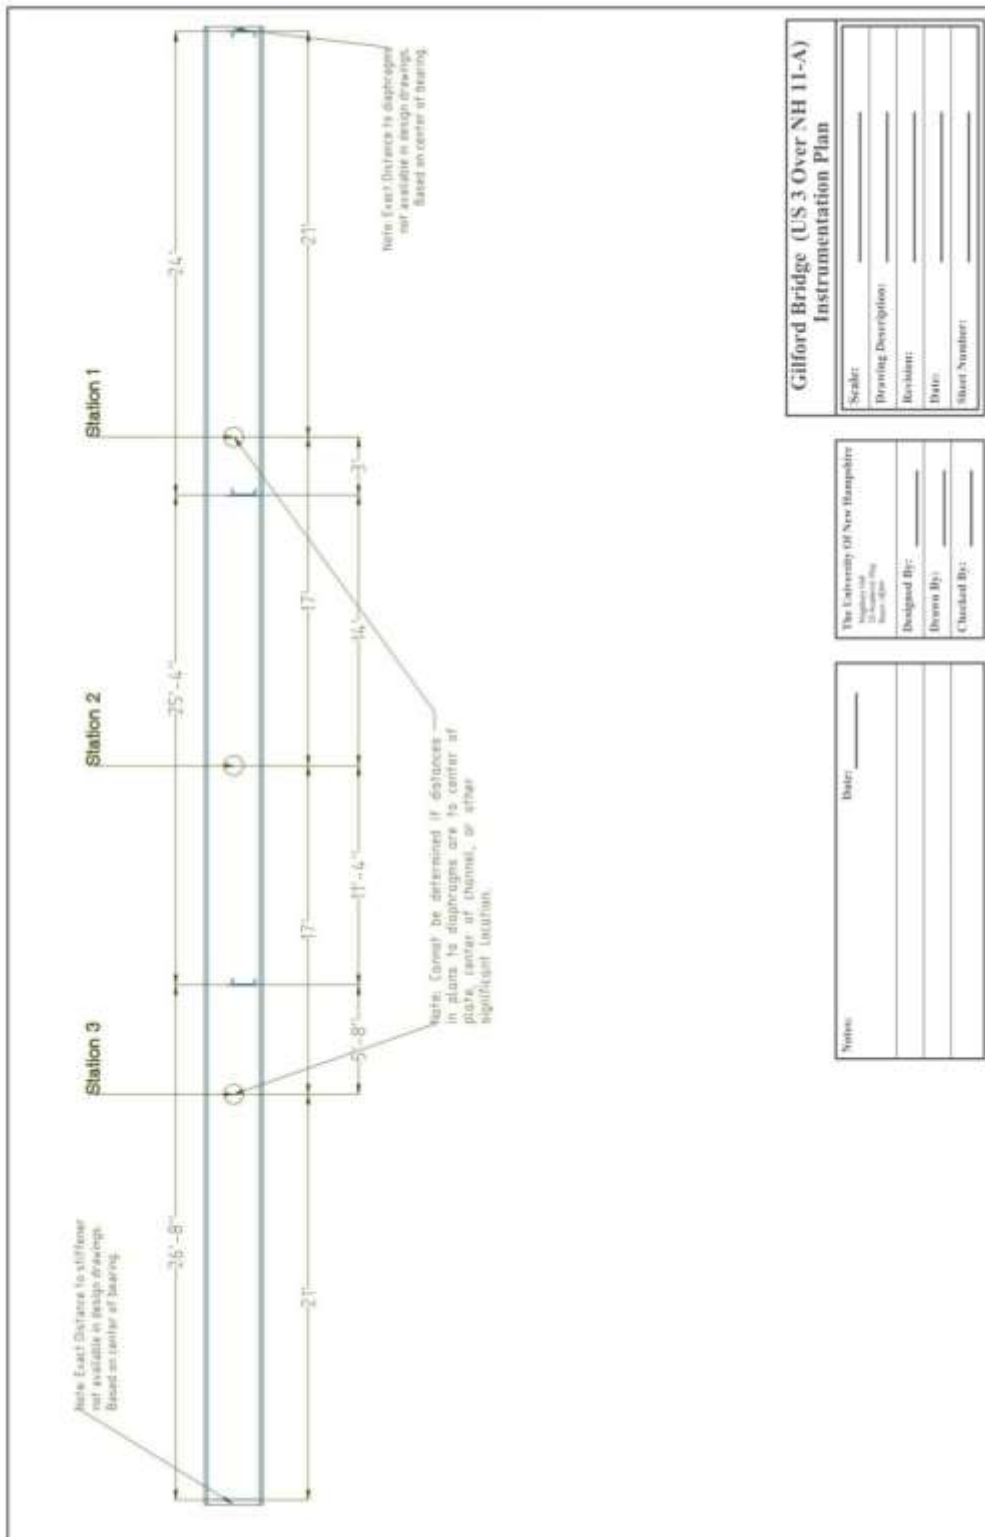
Gilford Bridge – Proposed Instrumentation Beam Elevations, Facing West from Bridge Center
